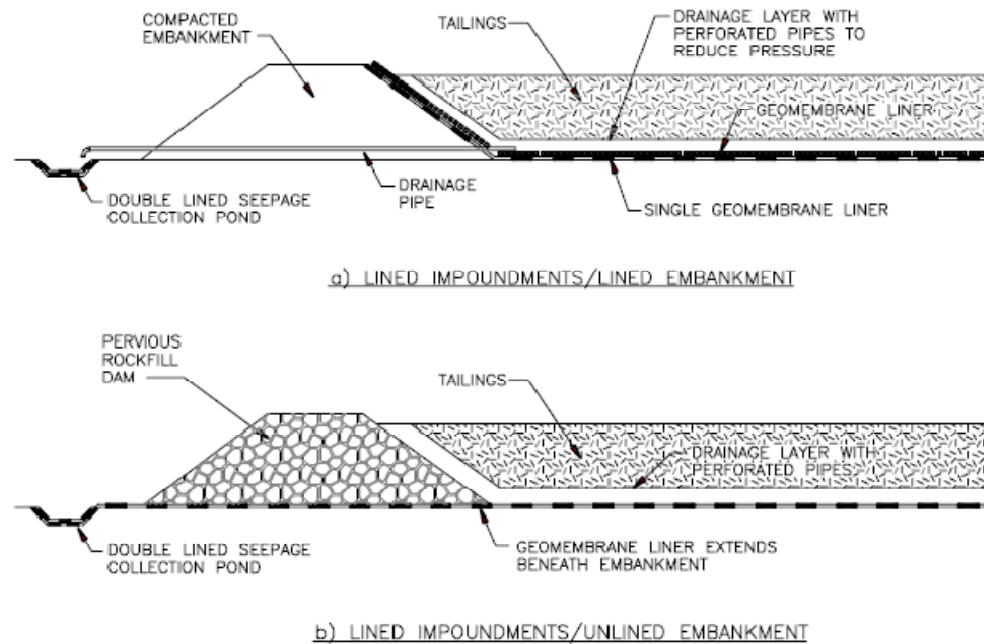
Conceptual sections of lined impoundments with underdrains (Davies, Lighthall et al. 2002).
